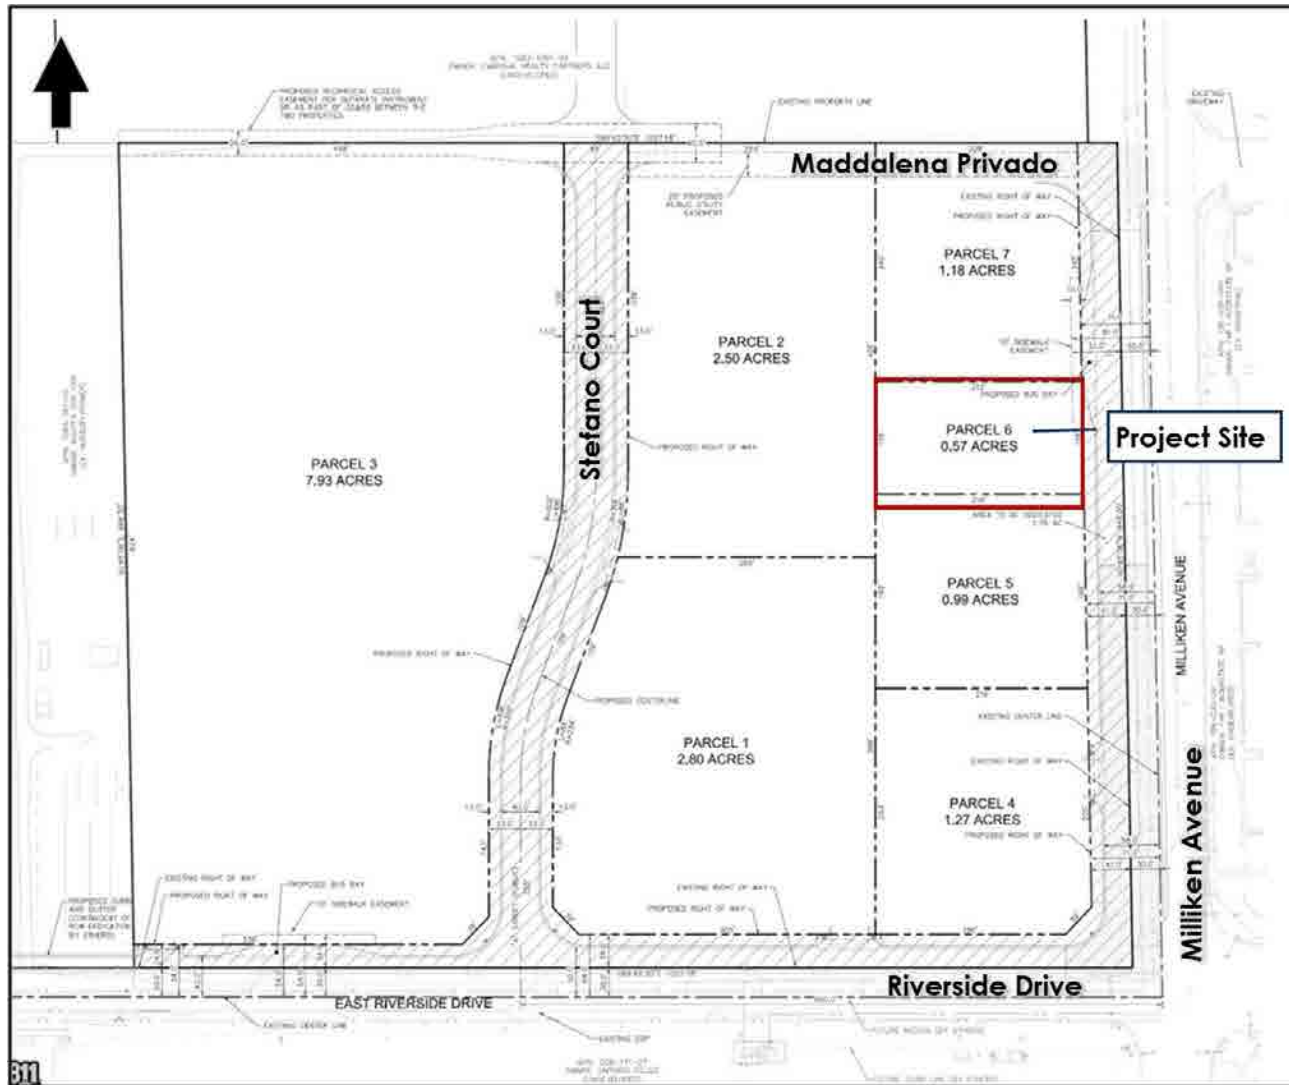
Exhibit E: OVERALL COMMERCIAL SITE PLAN
